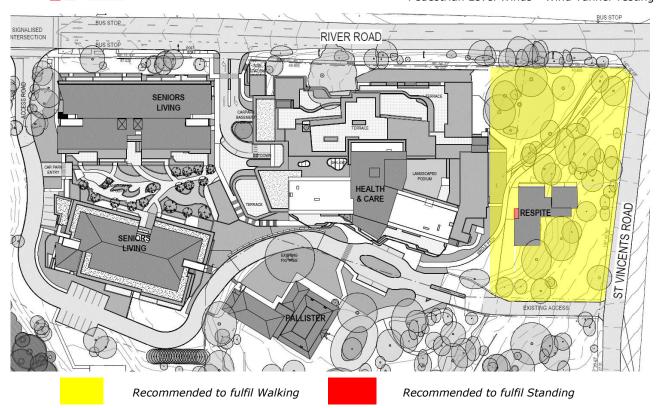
Site plan for the proposed development with recommended comfort criteria overlaid around the Respite Building.
